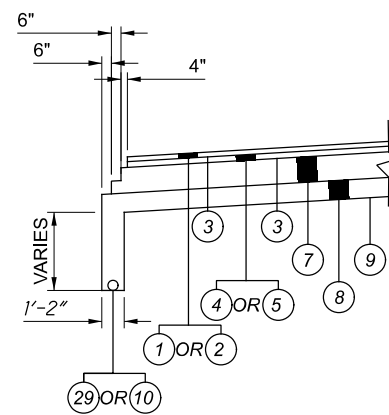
TYPICAL ASPHALT PAVEMENT WITH BARRIER EDGE COURSE
